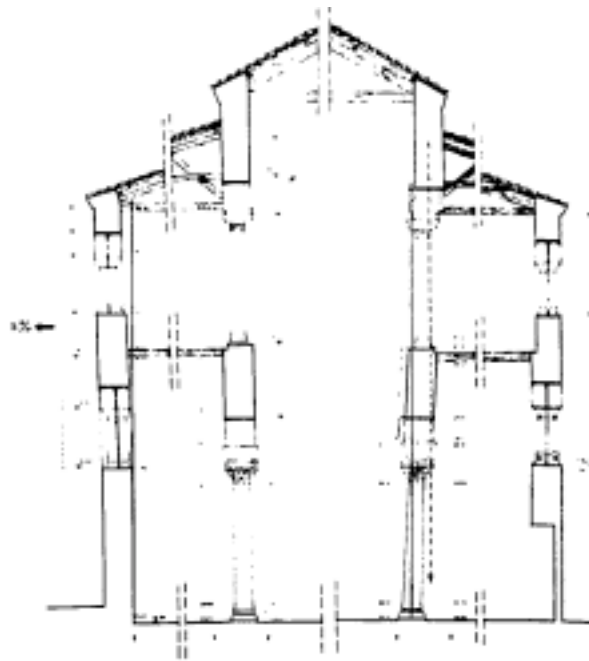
North - south cross section showing the inclination of the walls and the colonnades
